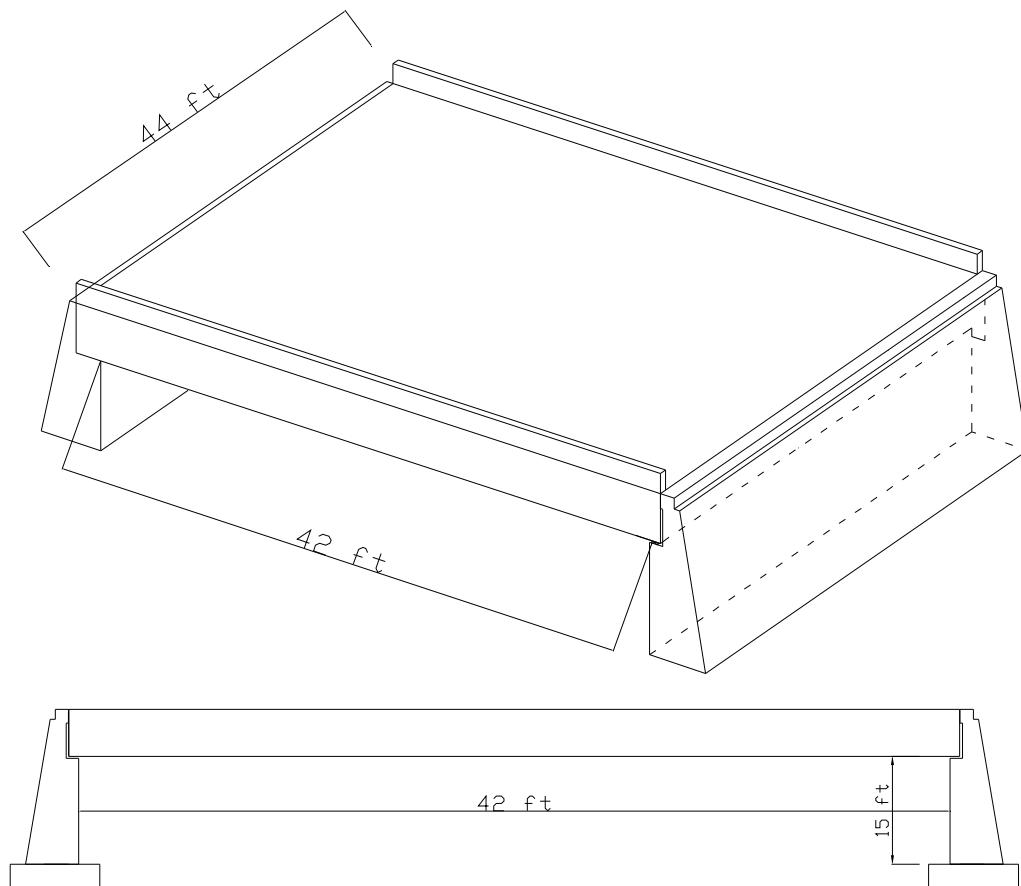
The Perspective & Elevation View of The Model Bridge.
